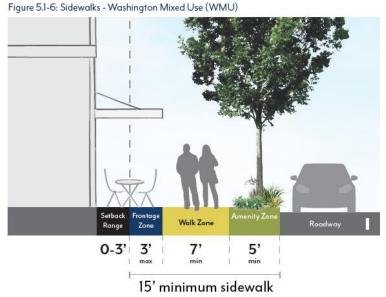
Sidewalks - Washington Mixed Use (WMU)
